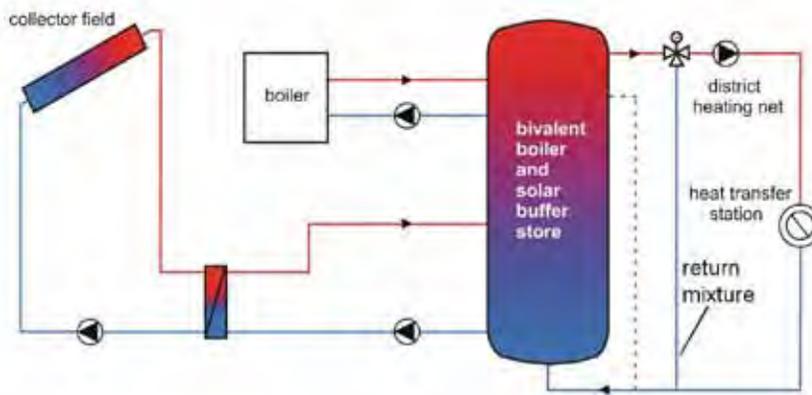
Heating net with four-pipe boiler reheating inside buffer store.
